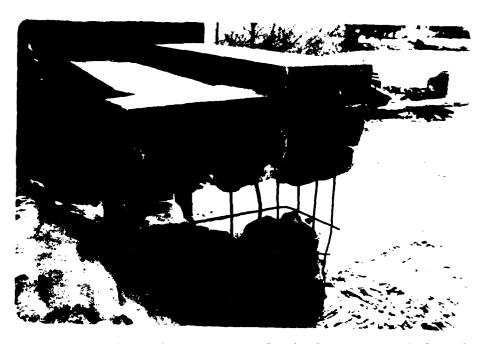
Deteriorated Concrete on Intake Structure at Left end of North Segment
